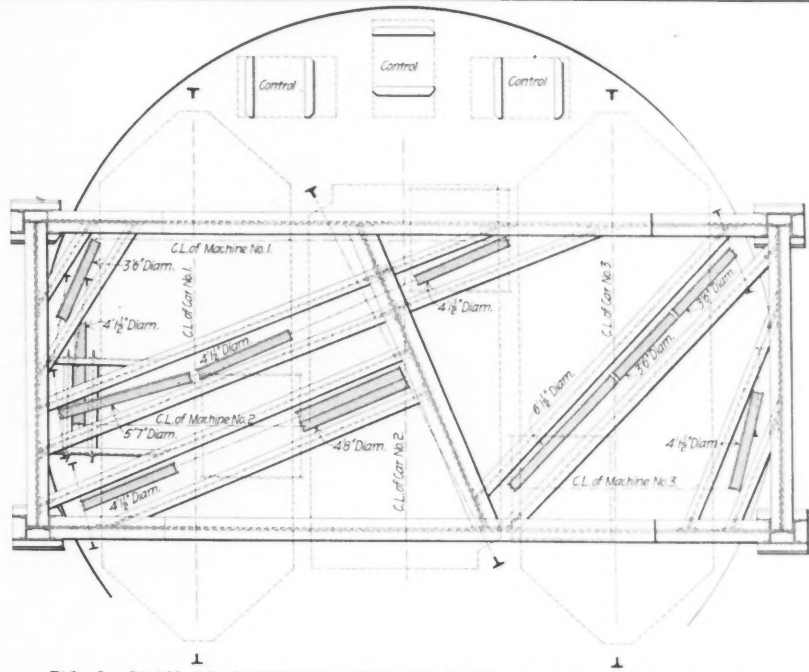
PLAN OF OVERHEAD ARRANGEMENT OF THE 30-FT. SHAFTS.
